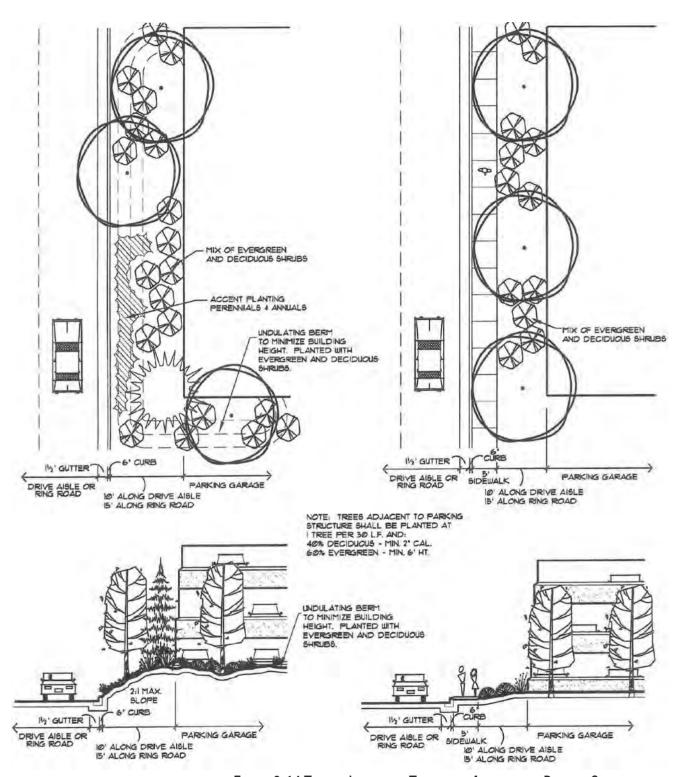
TYPICAL LANDSCAPE TREATMENT ADJACENT TO PARKING GARAGES
